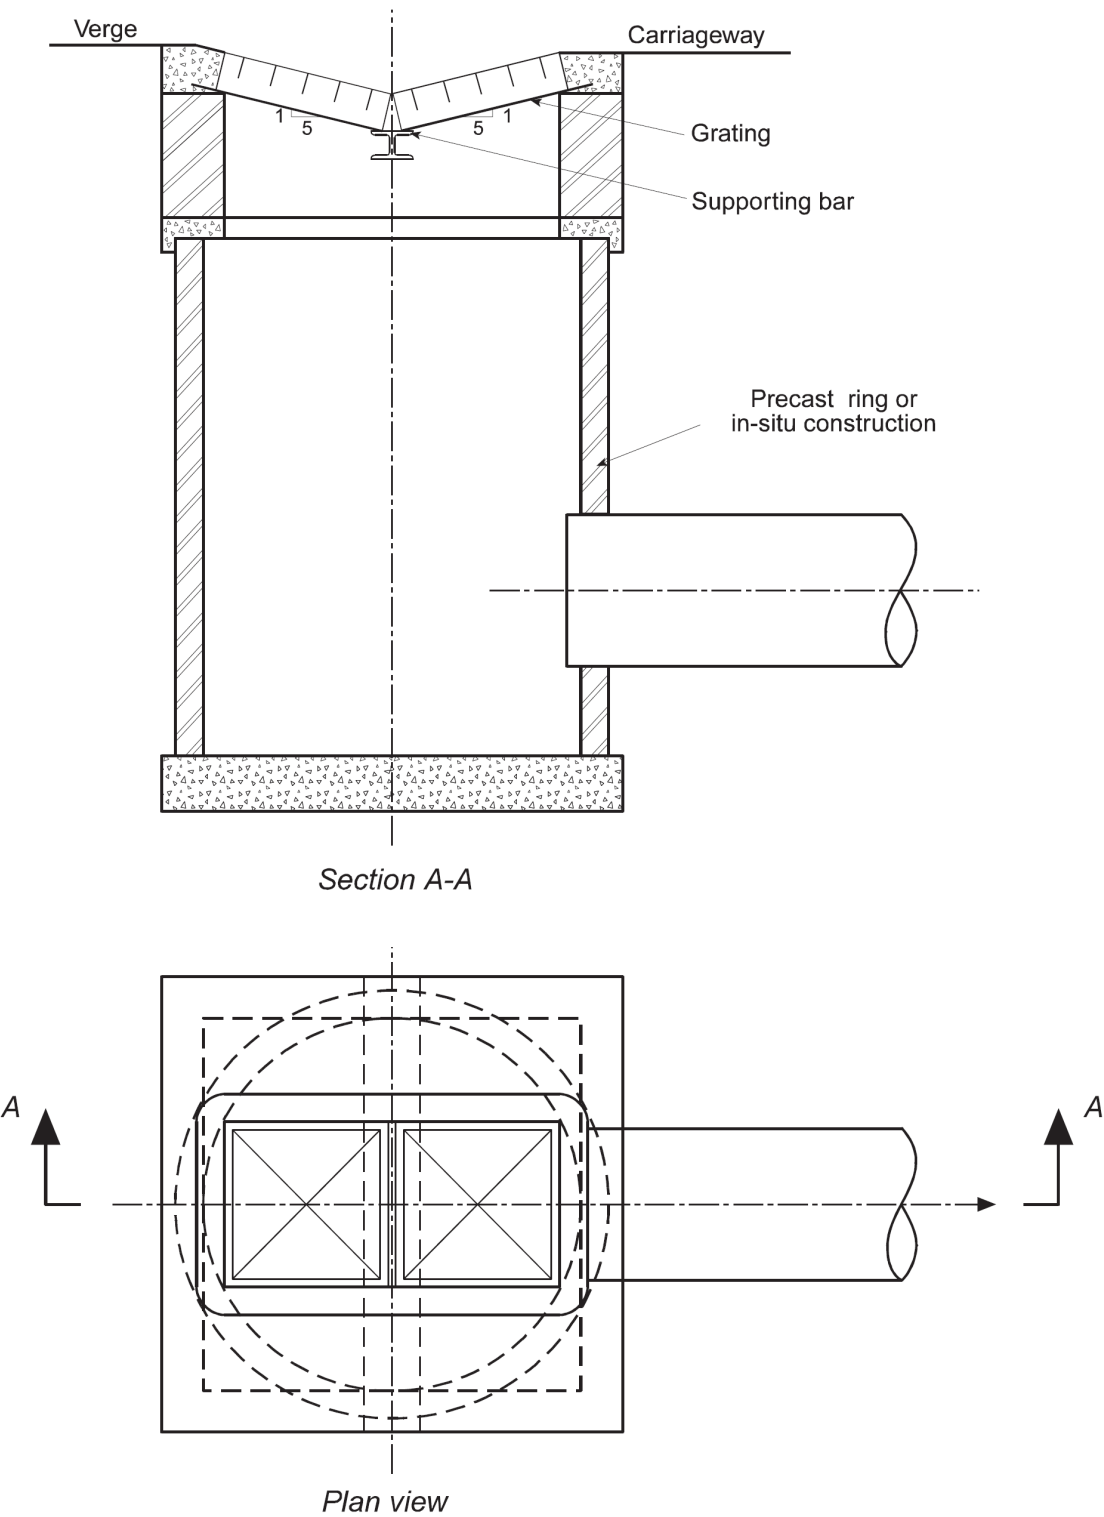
Example of terminal outlet - plan view (dimensions in mm)
